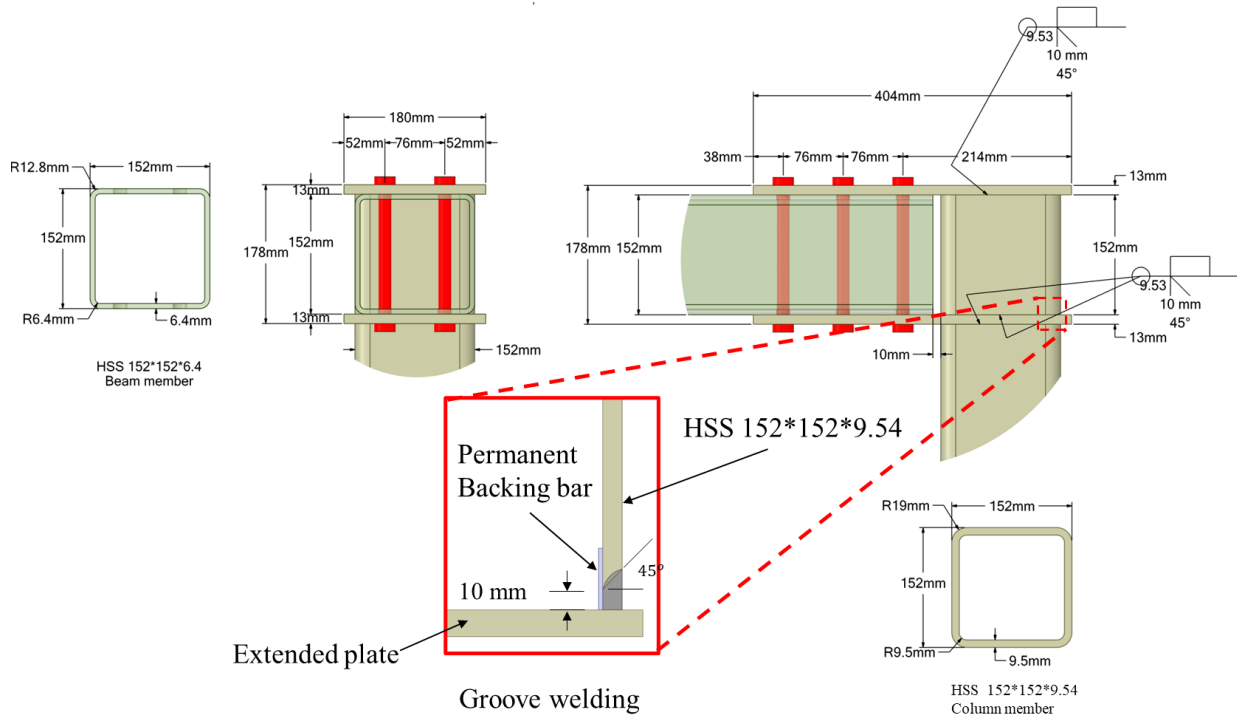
Detailed drawings of the specimen and groove weld between the HSS and extended plate.
